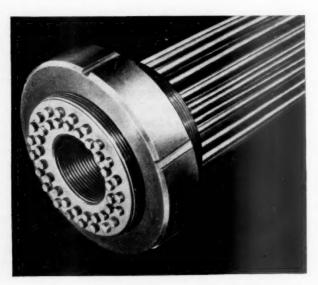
The B.B.R.V. nail head assembly, showing the threaded collar into which the drawbar is screwed
